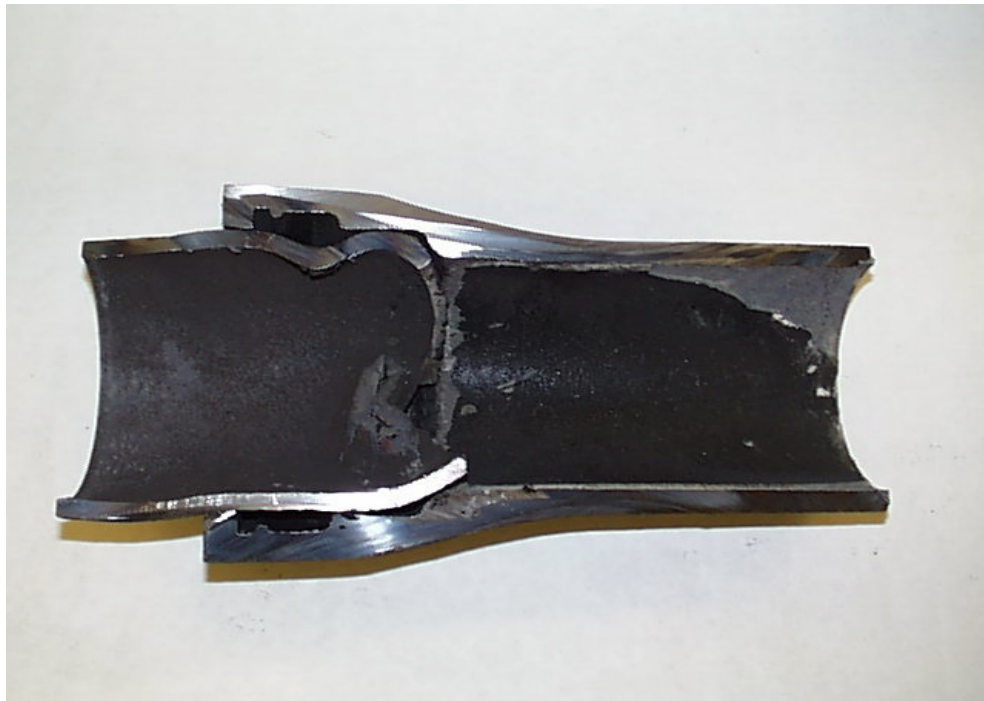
Cut Section of Ductile Iron Pipe with Push-On Rubber Gasket Joint
